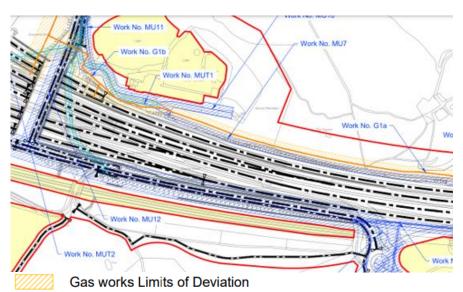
showing relocated gas pipe to north of the A2, hatched in orange (Taken from 2.6 Works Plans Volume B Utilities, sheet 4 link)
